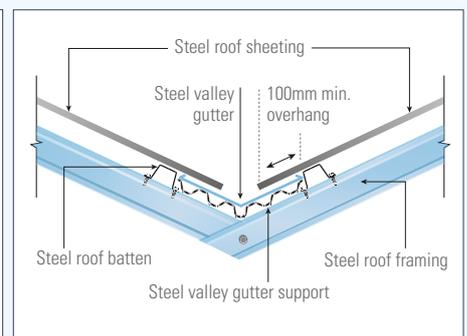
Roof system – valley details, BAL-12.5 to BAL-40
